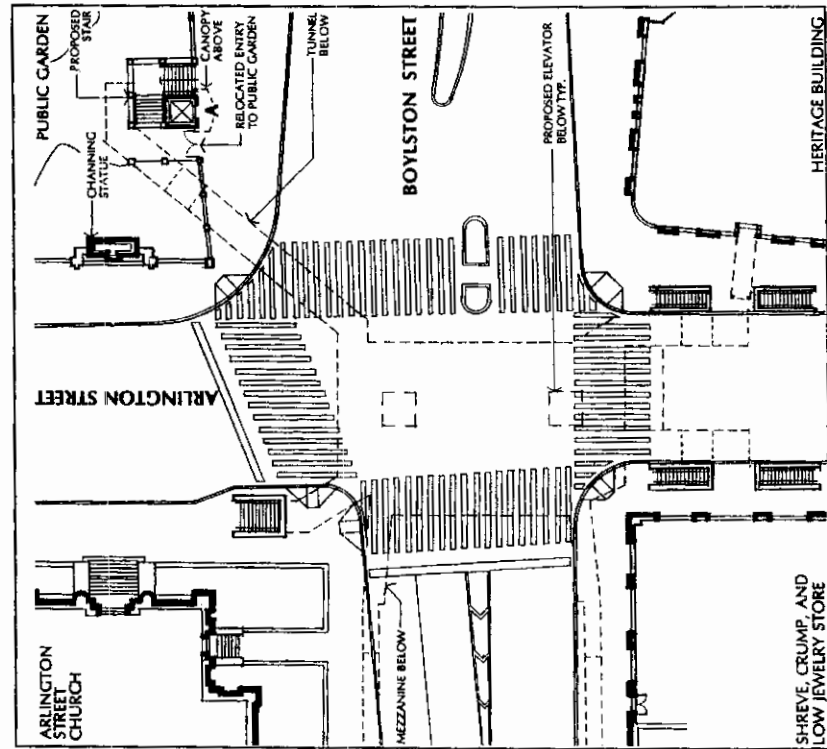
Elevator Option A, street level Scale: 1"=32'
